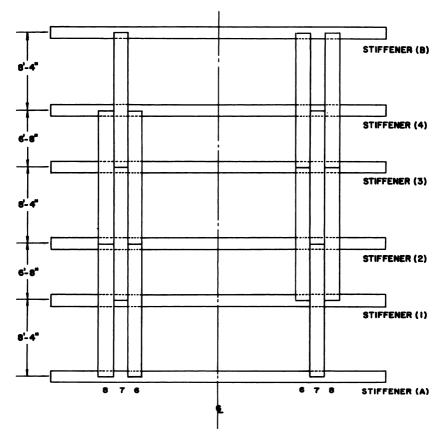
Frame for launching 38-foot 4-inch span, fixed bridge.
